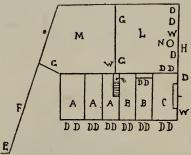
GROUND PLAN OF TOOL HOUSE AND YARDS.
